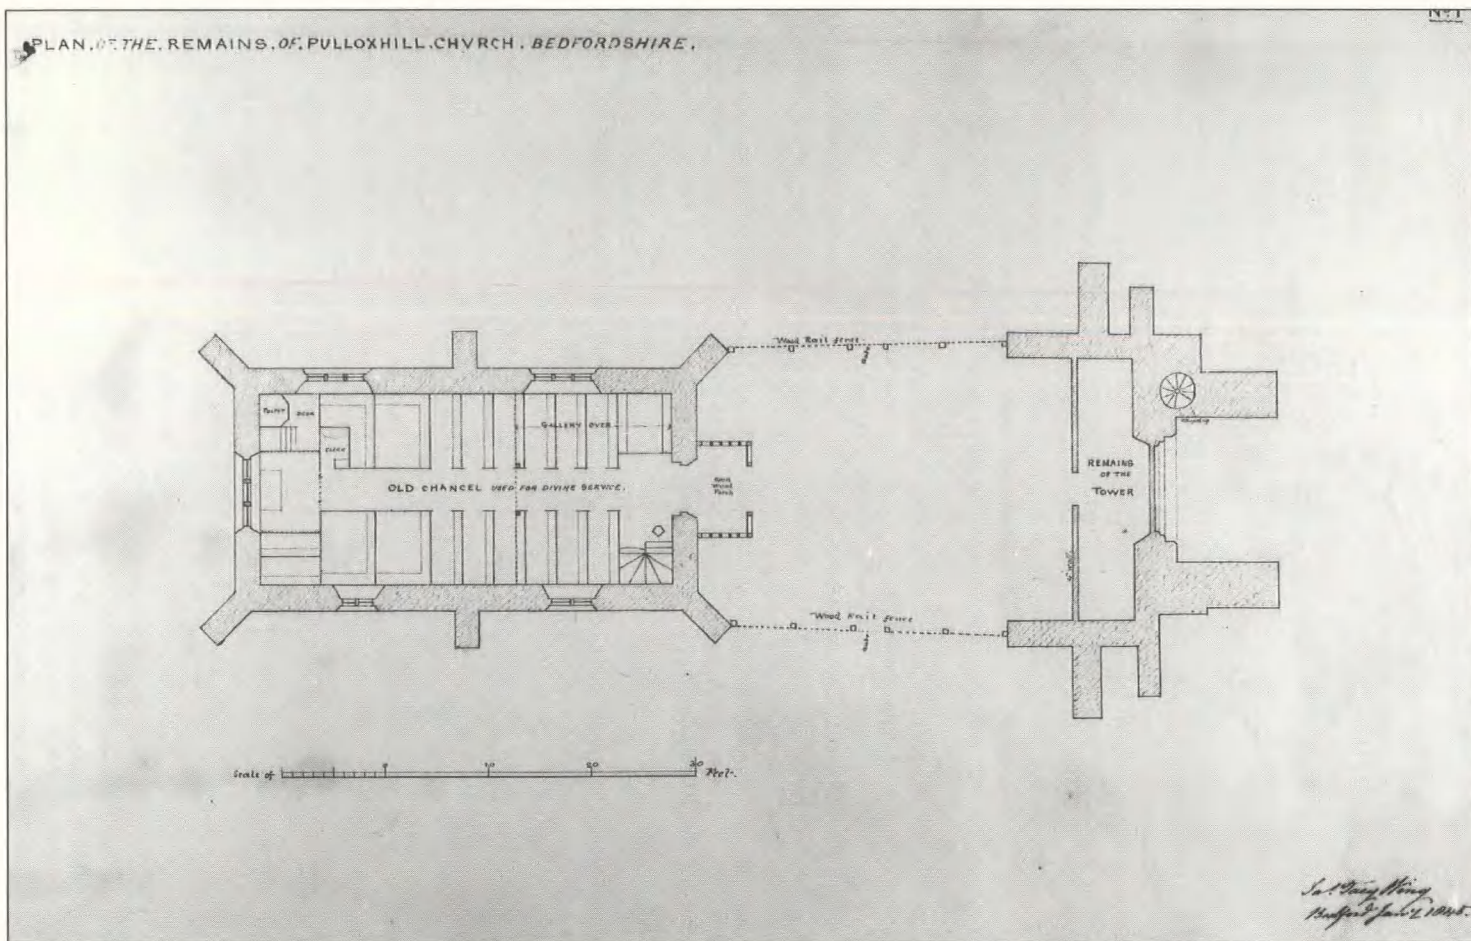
Plan of Pulloxhill church by James Tacy Wing in 1845 prior to rebuilding
